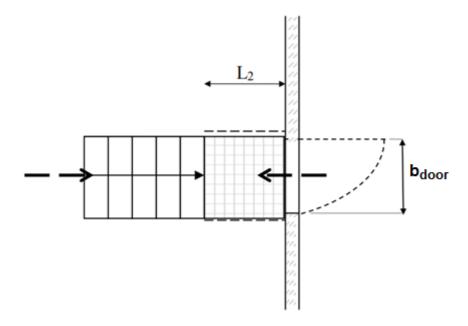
, dimensions of the platform and railing at a door that opens from the platform
